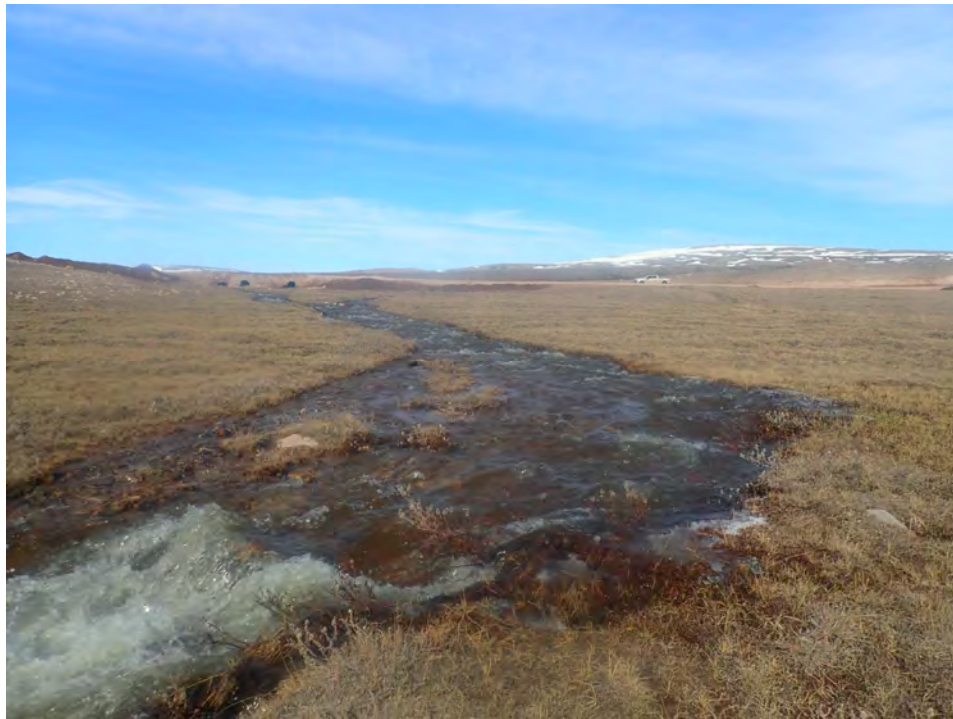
CV-112 Culvert Crossing Downstream on June 9, 2021
